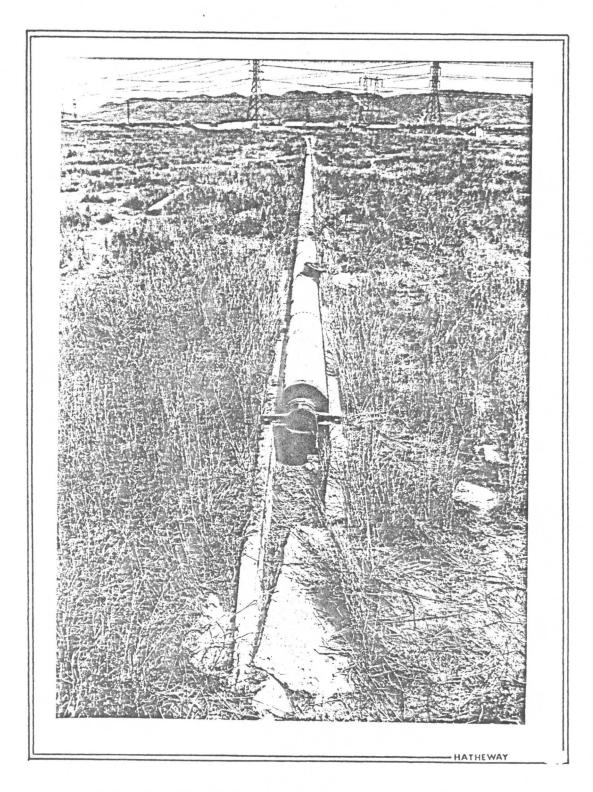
PROJECT AREA IRRIGATION CANAL #2
